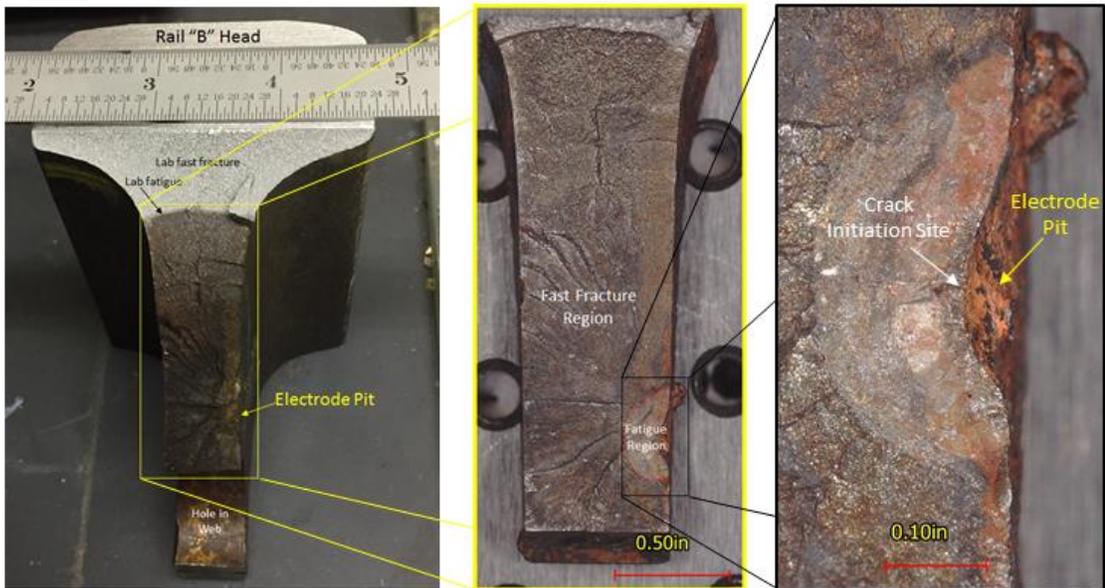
Photographs of Crack Fracture Surface in Examined Rail
